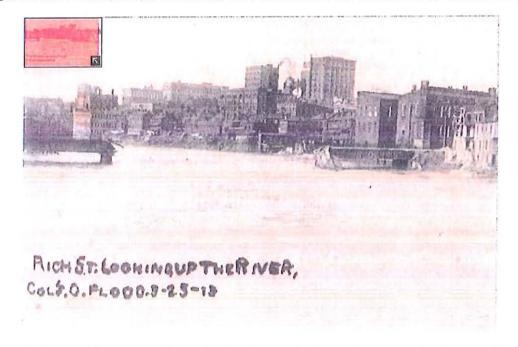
Rich Street Bridge (damaged), Franklinton, Ohio, March 25, 1913. Columbus Metropolitan Library
